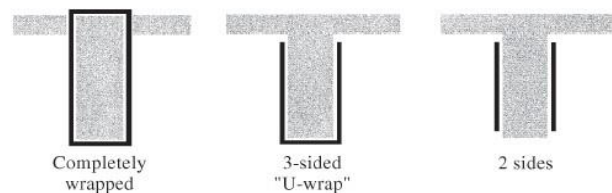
Typical wrapping schemes for shear strengthening of concrete beams using FRP laminates
